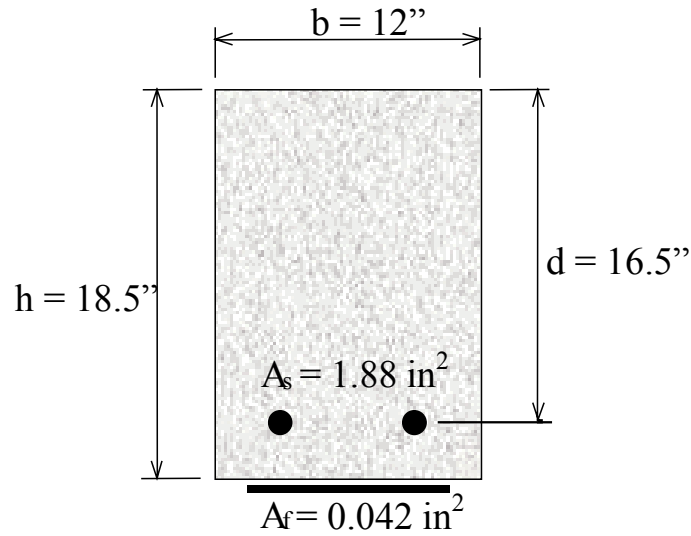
Cross-section of a deck strip showing bridge deck details.
